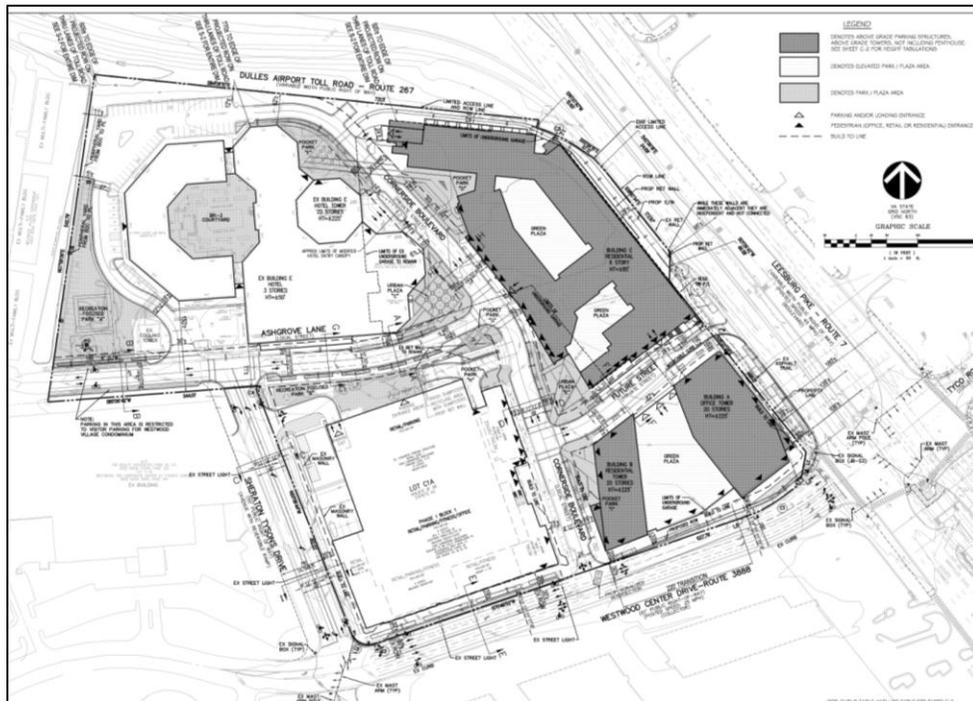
Development Plan for Tysons West (darker buildings are proposed)
